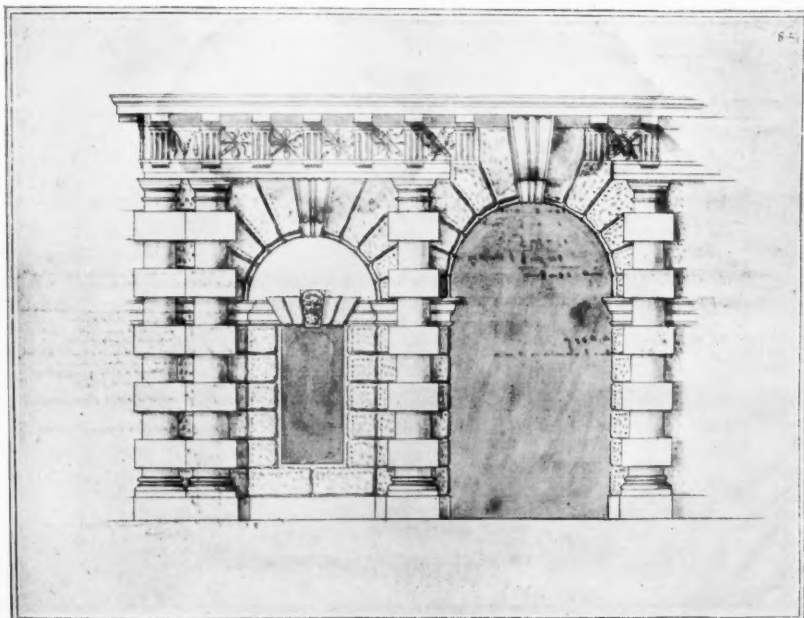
DETAIL OF THE GROUND-FLOOR STOREY OF A CORNER PAVILION OF THE EAST ELEVATION, FIG. 7
